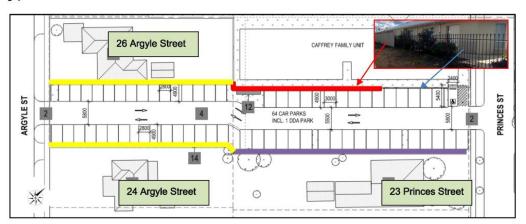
Carpark - Existing fence-line extent (red and purple line); Proposed new fence (yellow line)
